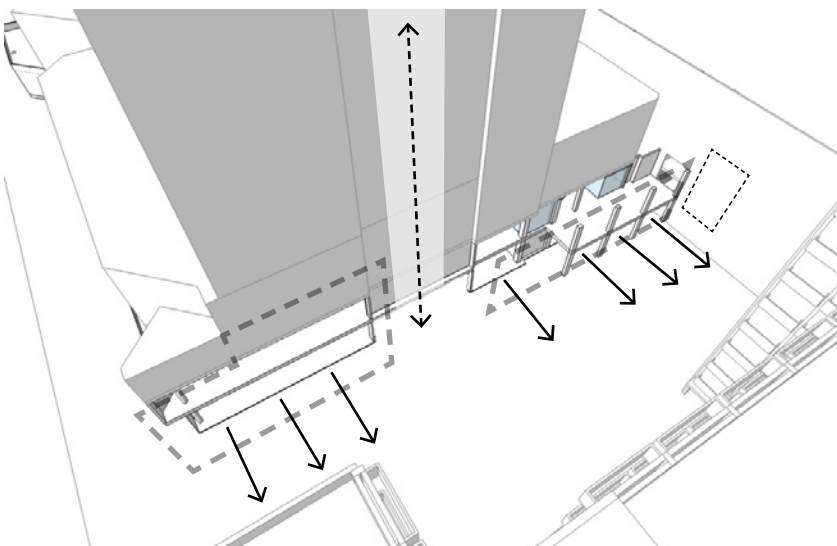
Demolish the outer layer of Momentum facade, leaving volumes exposed. Store rubble on site. Utilise existing elevator shaft to provide future vertical circulation.
